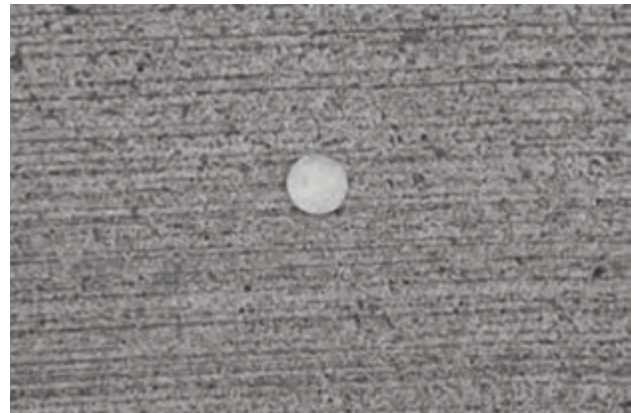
Photograph of a typical concrete surface created using transverse brooming.¹⁰⁹
